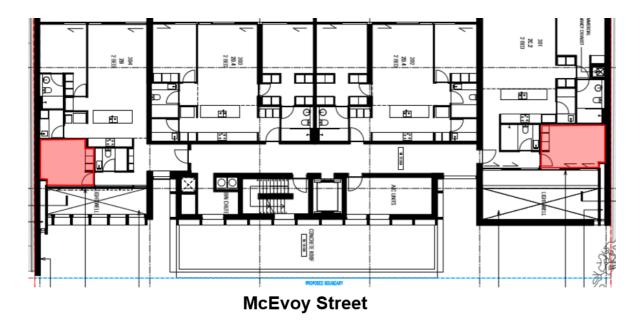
Location of noise-affected bedrooms on floor plan (indicated in red)
